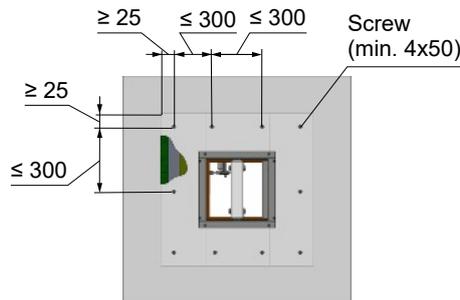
Outside gypsum wall construction - Mineral wool, stuffing box, fire protection mastic and cement lime plate
